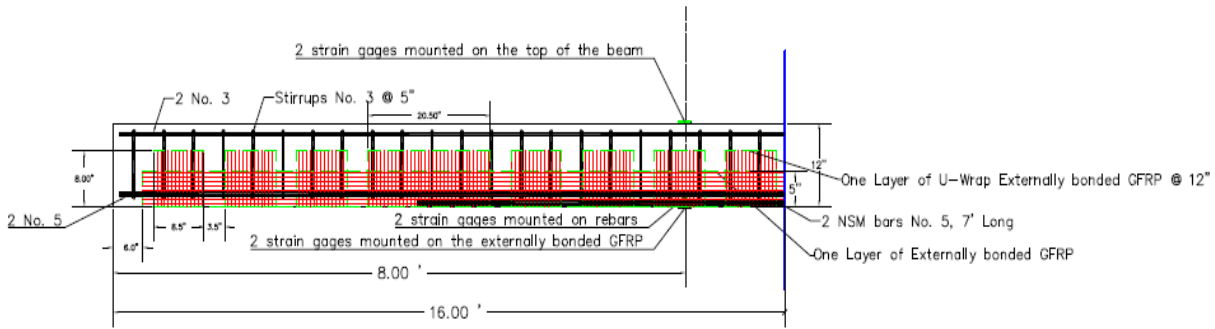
Reinforcement Details for 7.0 ft. NSM rebar Beams (Specimens R3 & R4)
